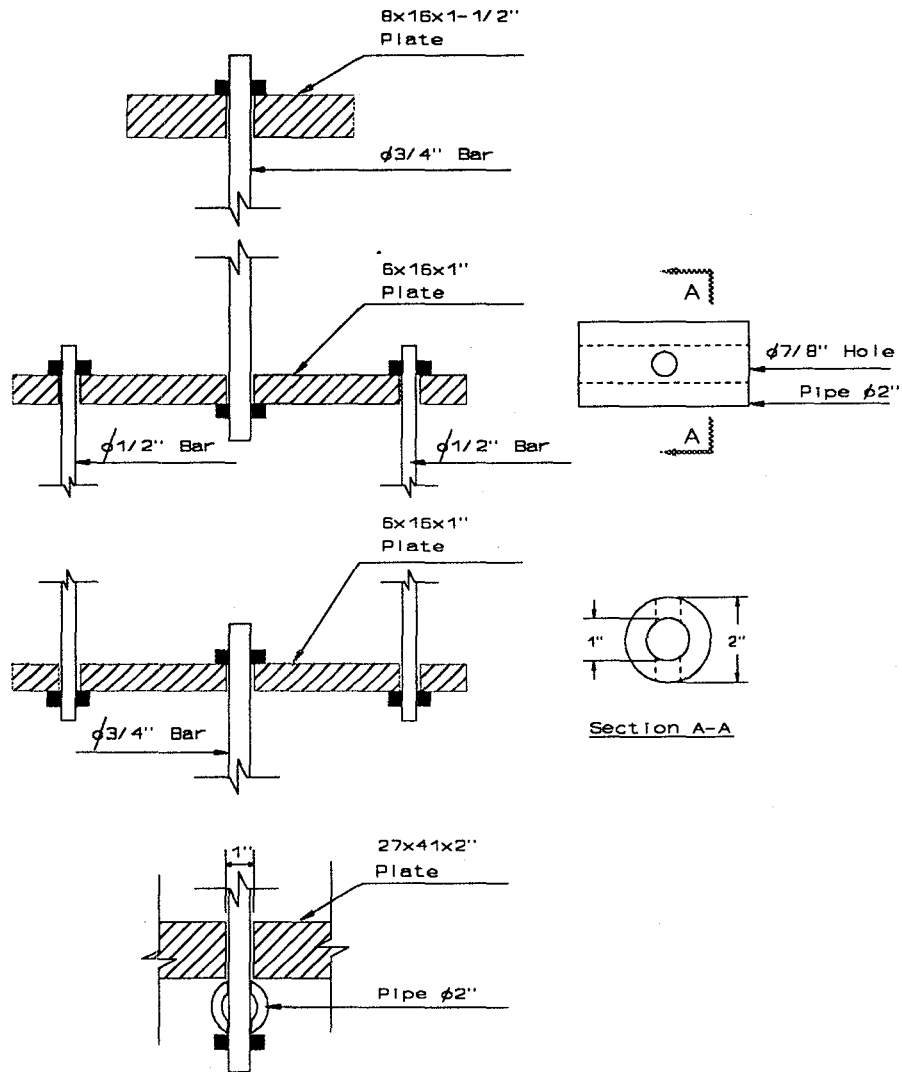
Detail Connection Vertical 3/4" diameter bars and Test Rig
